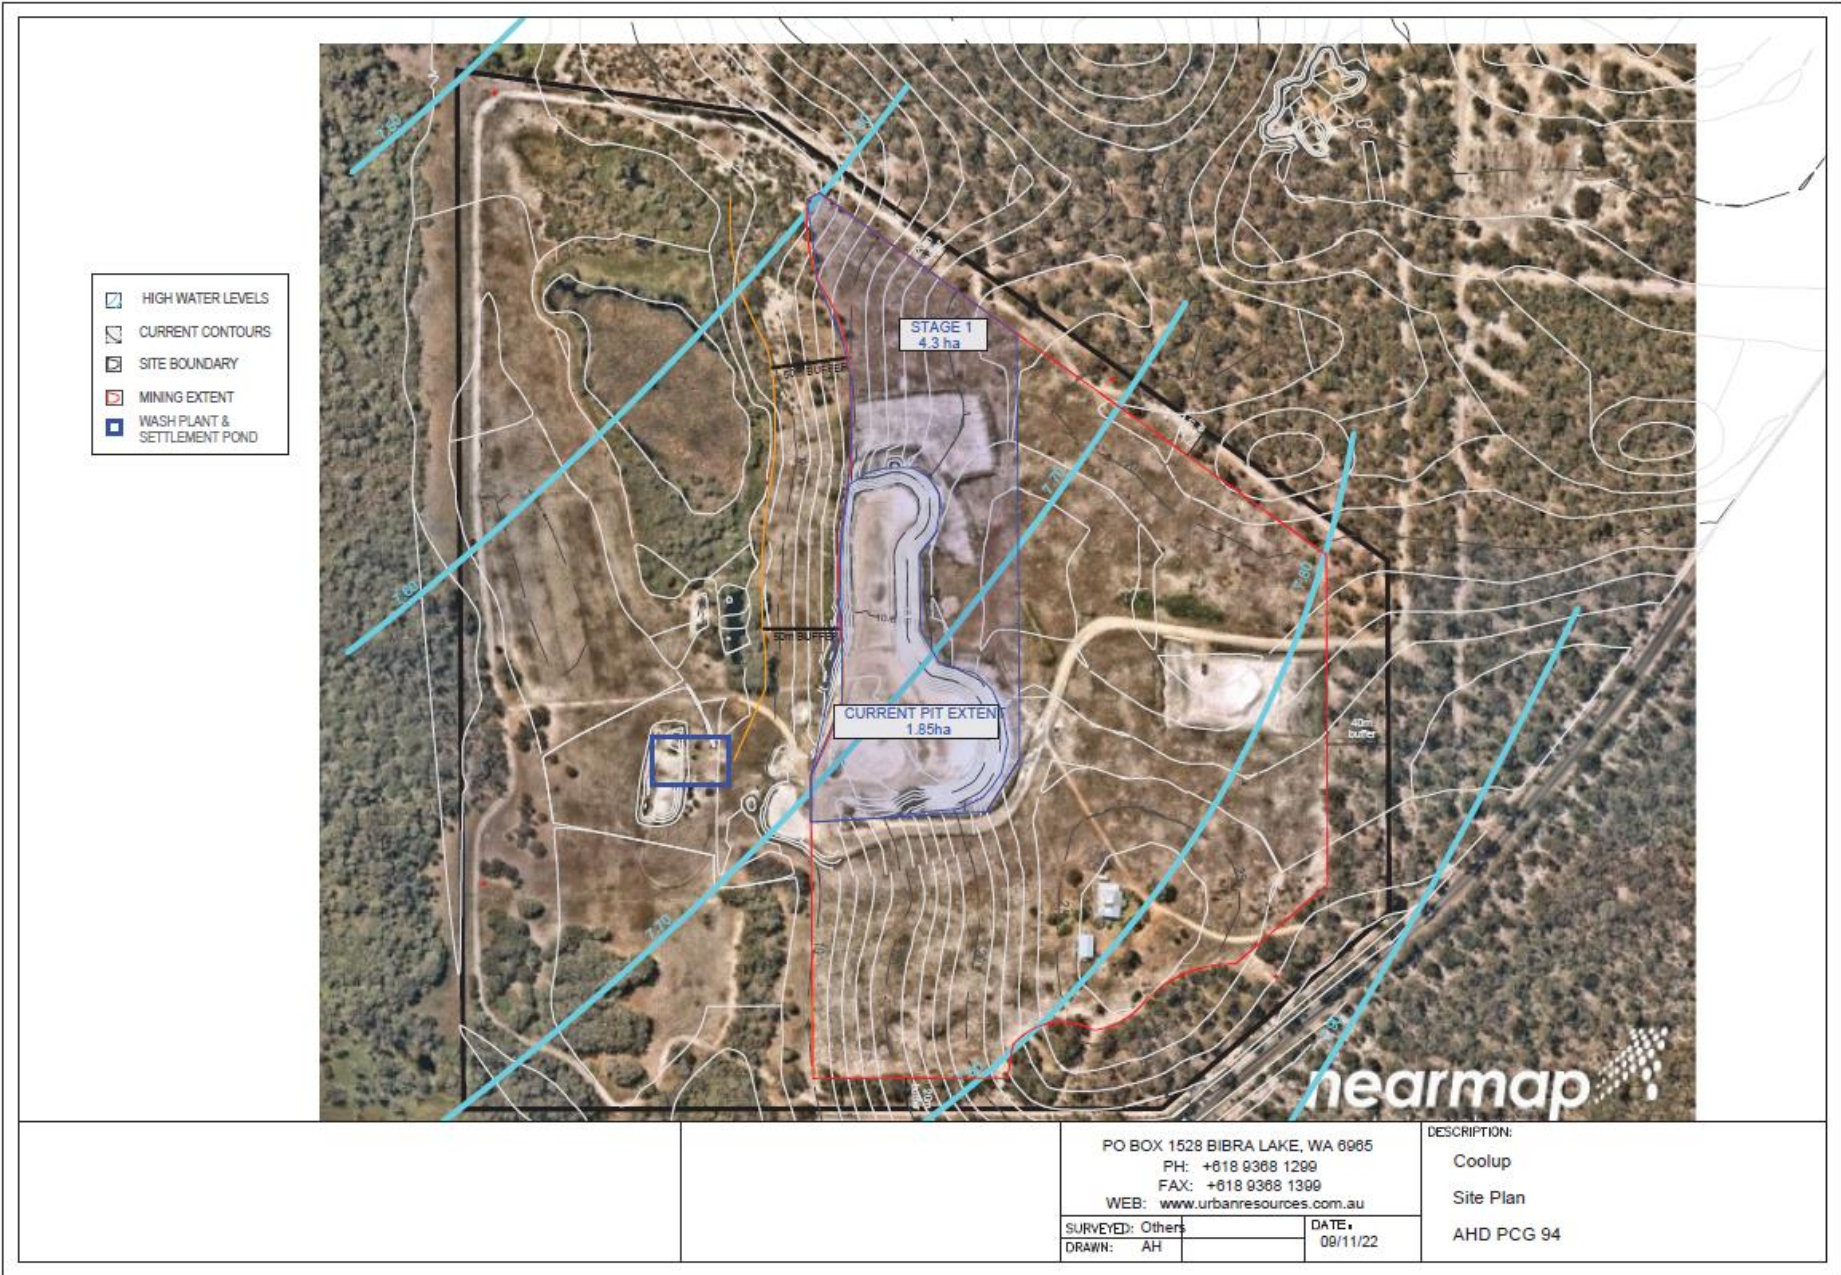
Site plan, mining extent and wash plant location Source: figure provided by applicant
